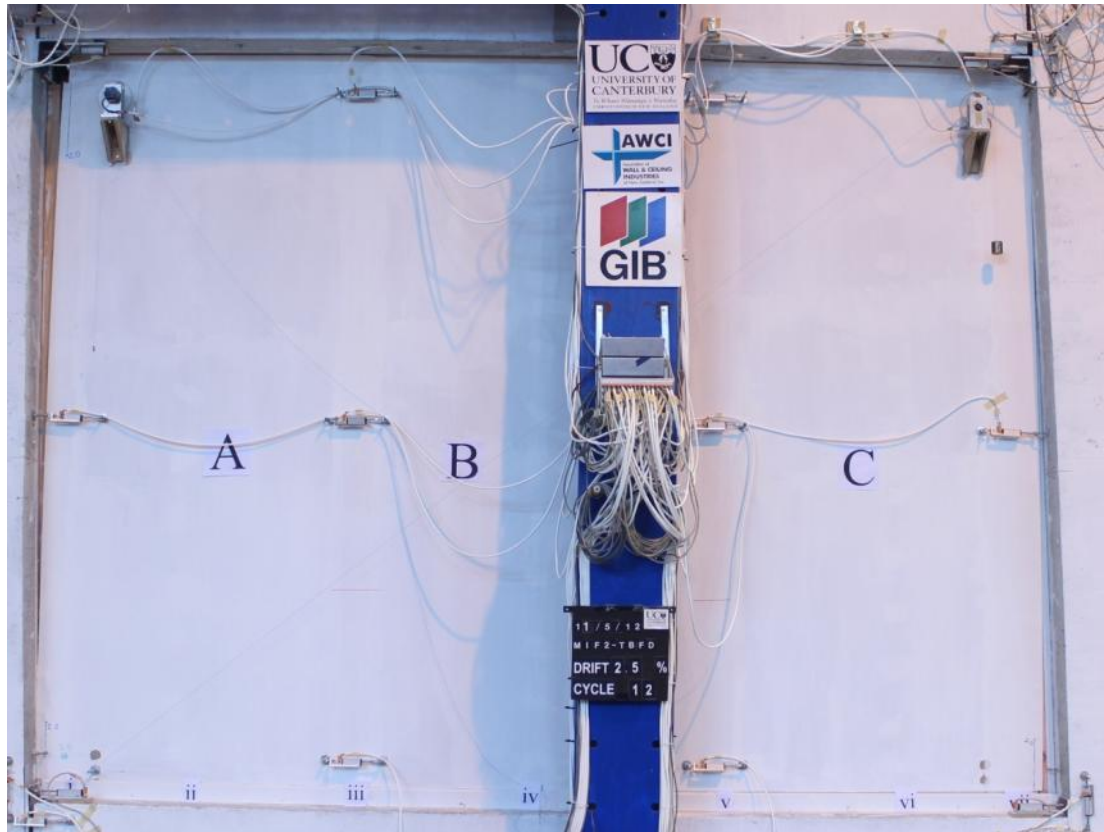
Low damage timber framed drywall specimen MIF2-TBFD about to be completed
